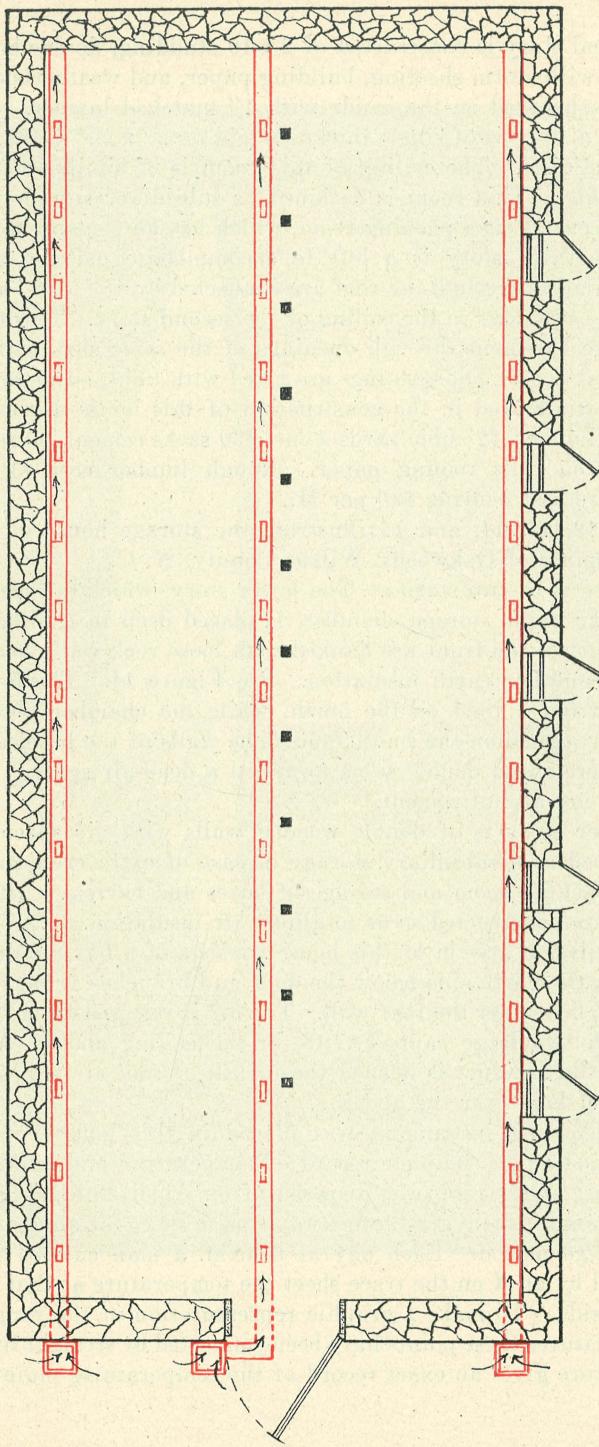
Storage chamber of Mr. R. N. Barber's apple house, showing ventilating ducts.
